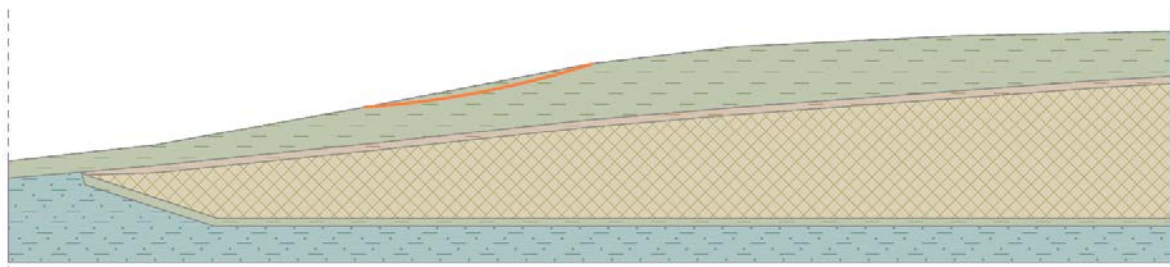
Section 2-2 South, $r_u=0.1$, shallow slump
